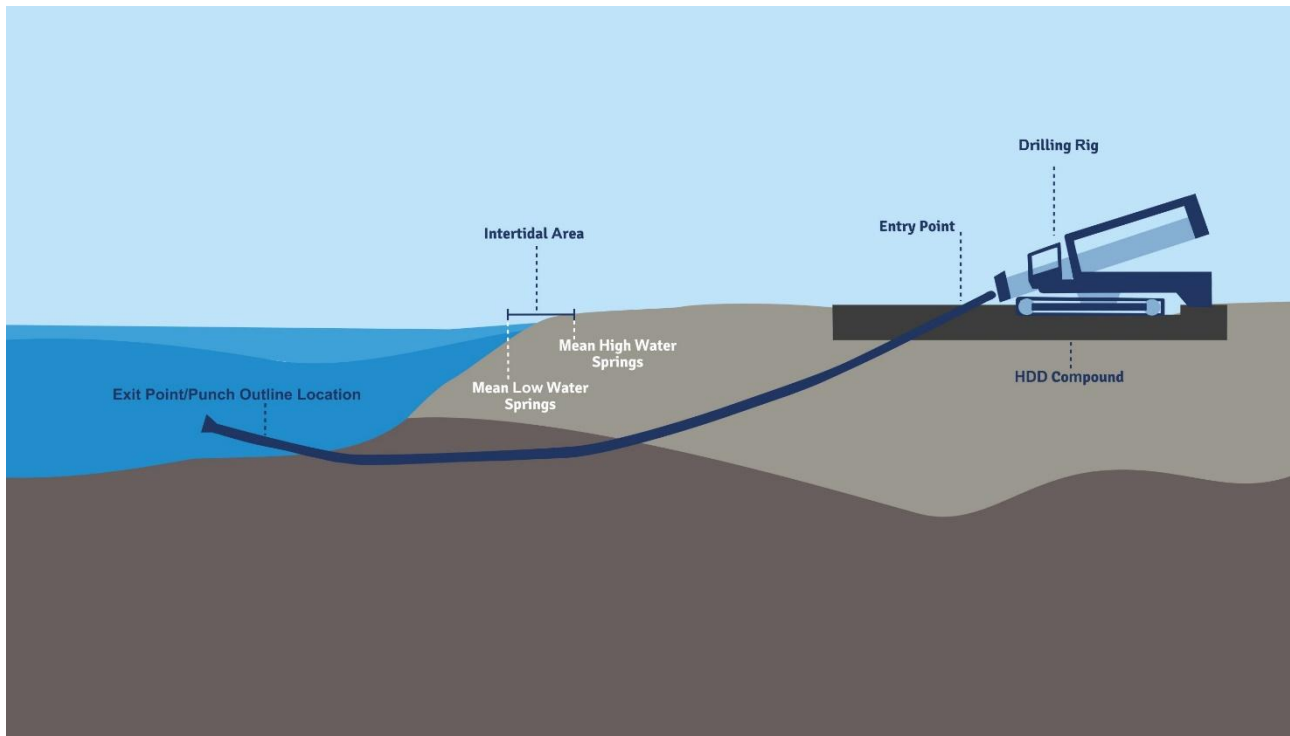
Cross Section Showing Trenchless Technology at Landfall
